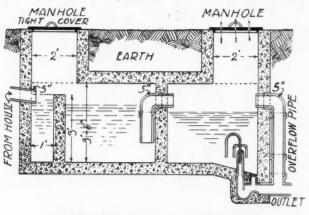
Concrete Septic Tank for Use in Level Ground.
